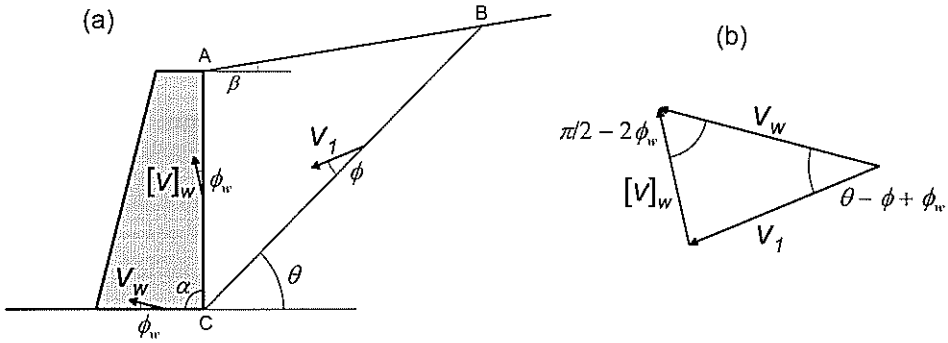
Failure of a vertical ($\alpha = \pi/2$) retaining wall: (a) mechanism, and (b) hodograph.
